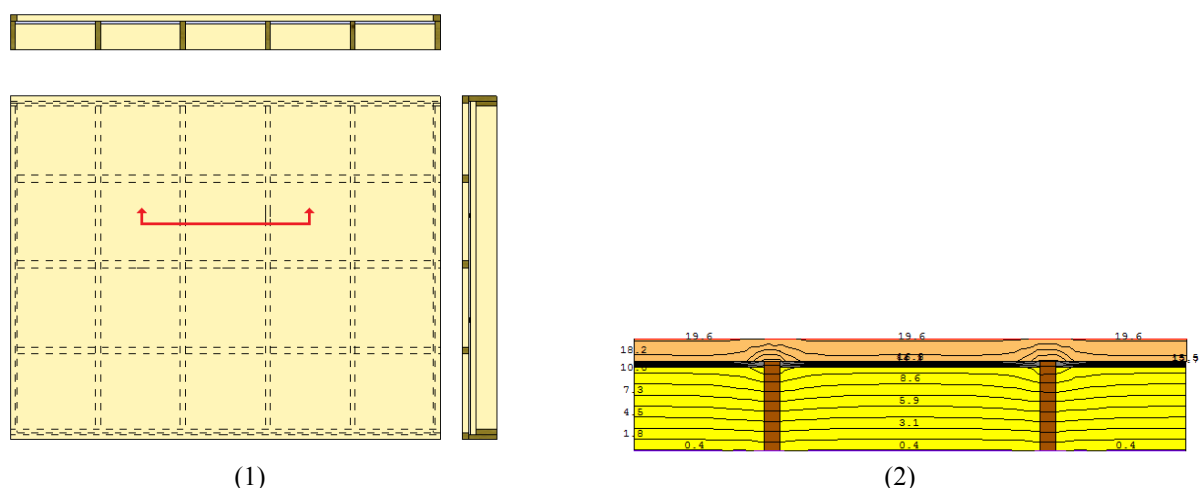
Timber frame wall (1) and a horizontal section of the wall modelled in THERM (2)
